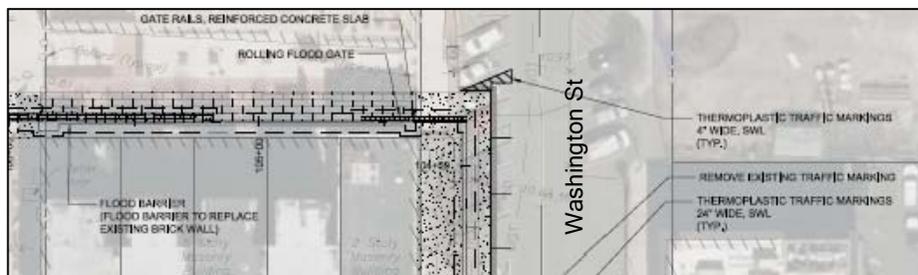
Washington Street to Bloomfield Street Alleyway Flood Barrier
